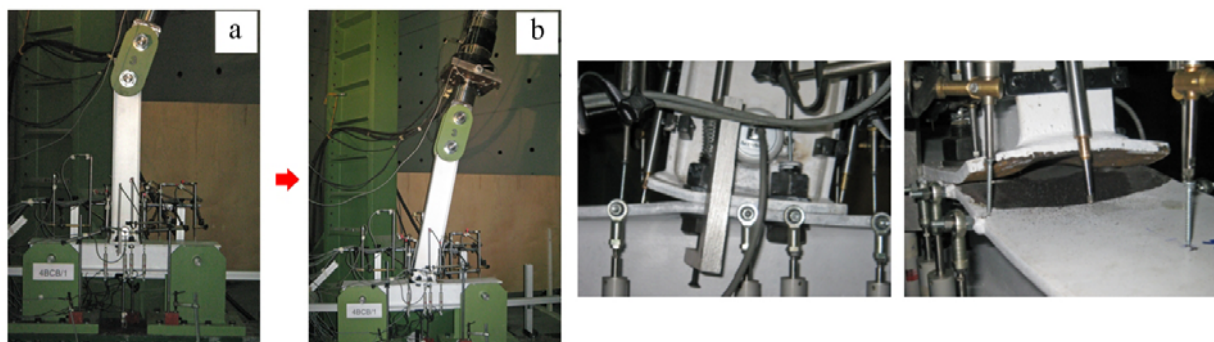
Test on the complete joint – Initial beam-to-actuator angle of 20°
